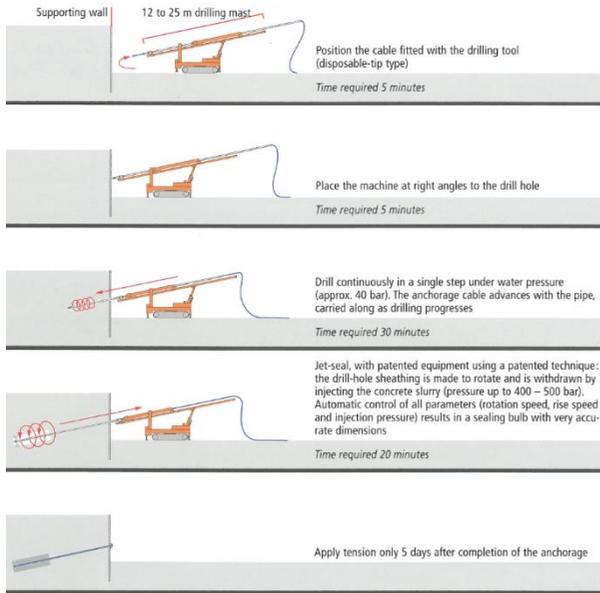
construction sequence of an Anchor-Jet® anchor (image: Forasol SA)
